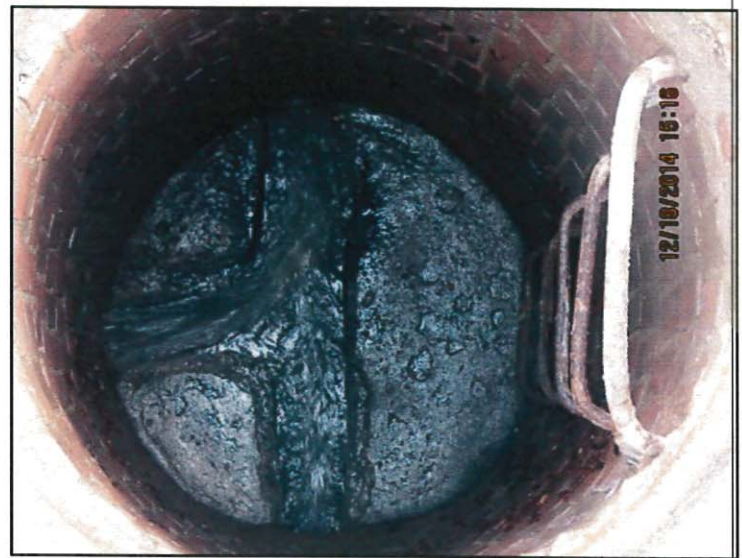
Manhole inspection (view 1); note heavy buildup on manhole base and in sewer line
